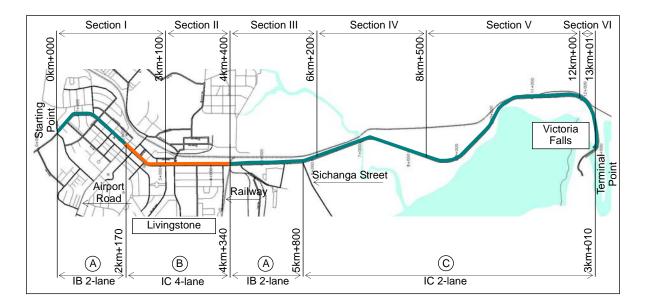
Route Division through Existing Pavement (Upper Section) and Road Standards (Lower Section)
